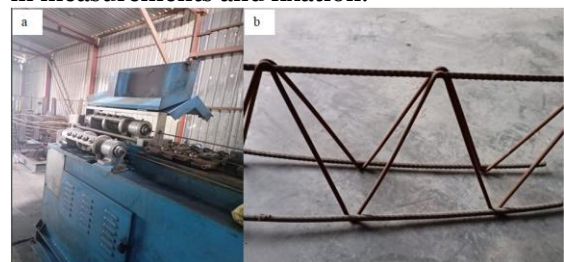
(a) Machines for Reinforcing Longitudinal and Stirrups, (b) Output Reinforcement of Steel.
